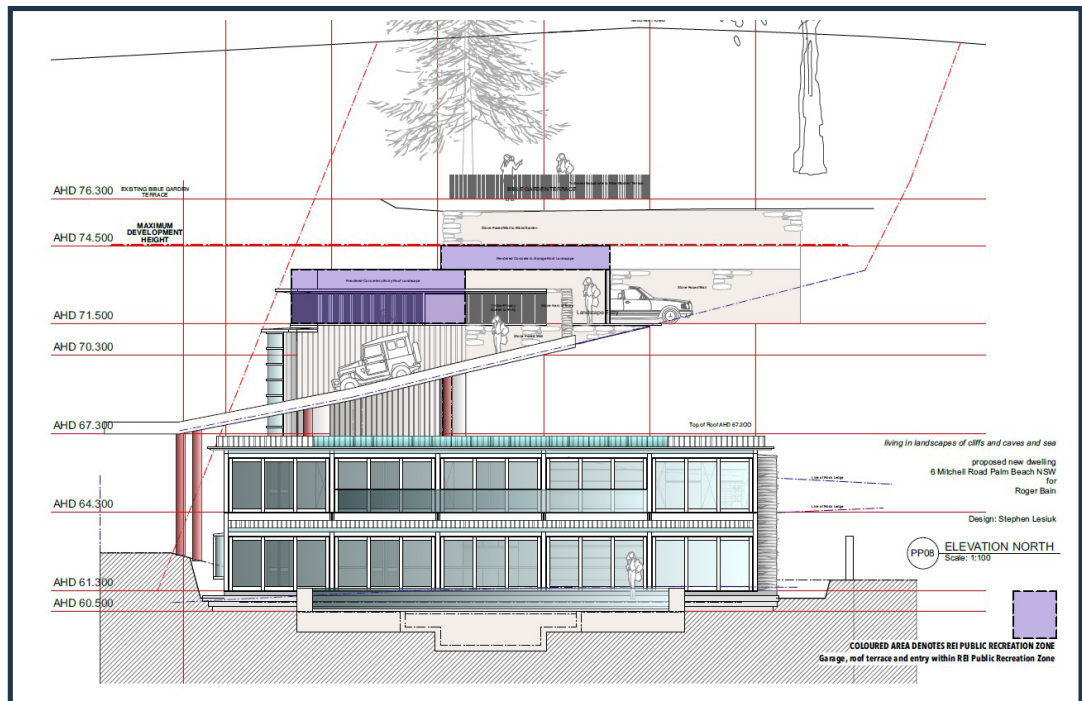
Concept Circulation Plan detailing the garage as below the Bible Garden and height limit (Source: Housed Architects)
